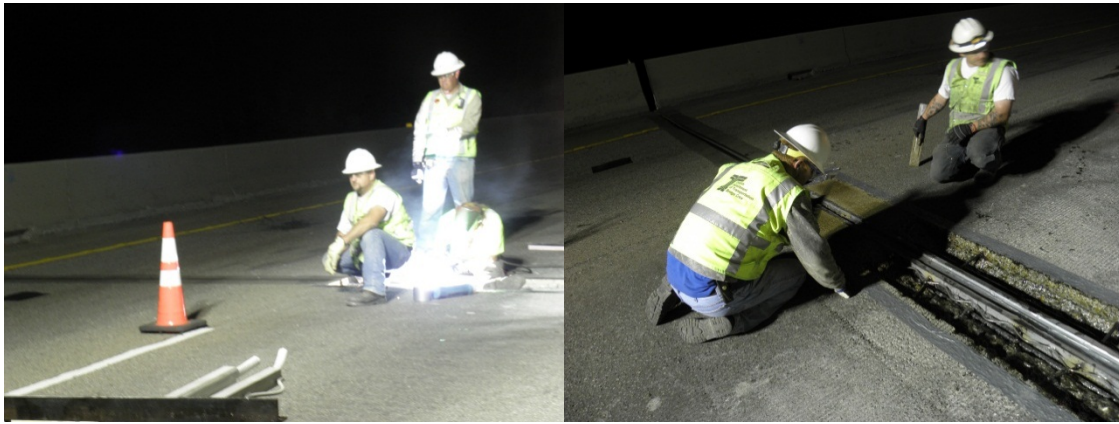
Welding of the Joint (left); Placing Concrete (right) (Case Study #6)
